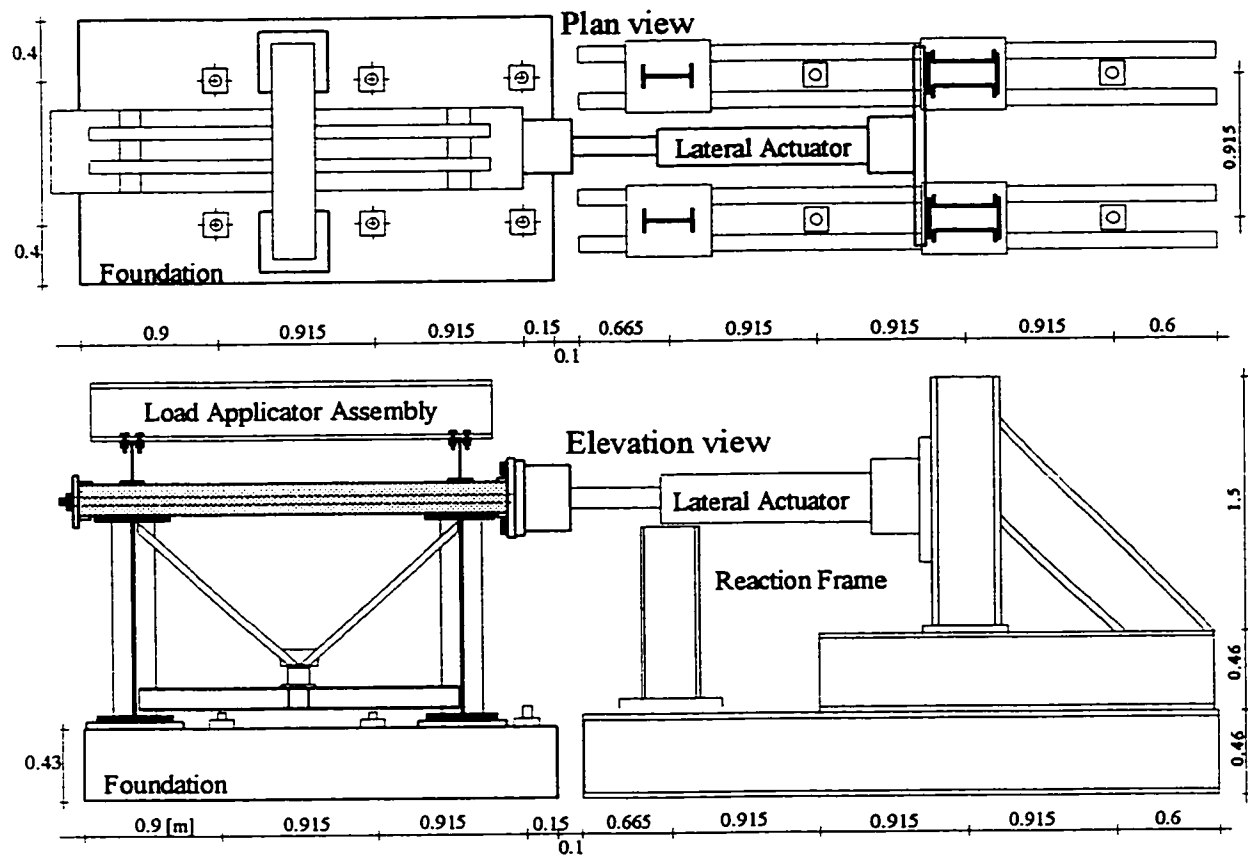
Plan and elevation schematical views of test set-up prepared for experiments.
